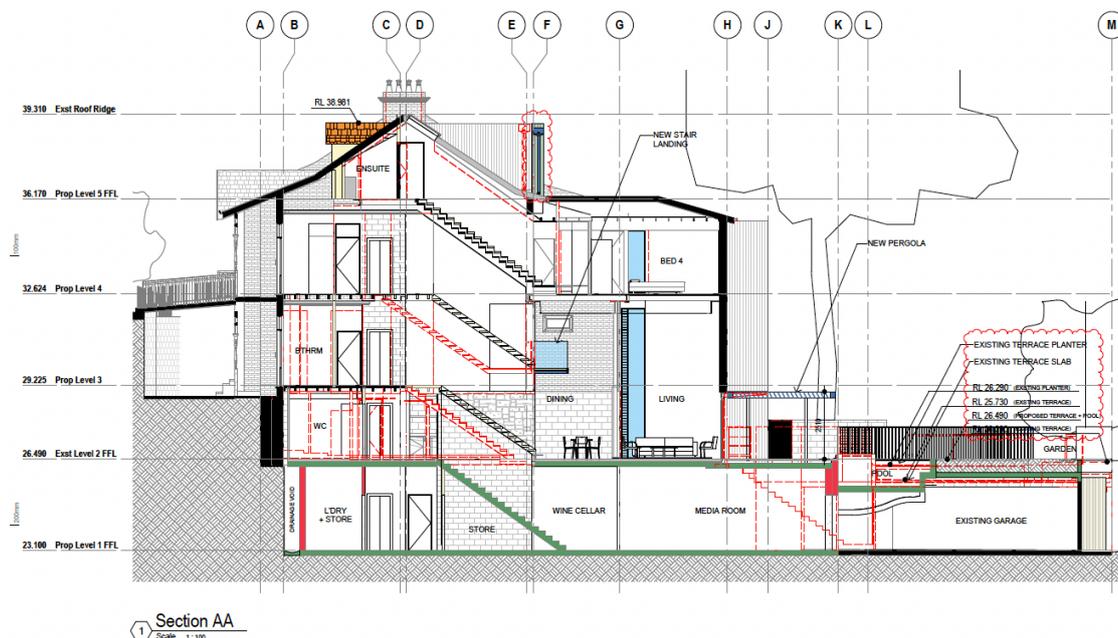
Extract from Drawing DA251 Section A-A, Revision E, shows the two dormer roof elements either side of the existing main roof and ridge and the existing ground level, the floor level of Level 2 shown dashed in red. Clouded in red the amended rear dormer will be reduced in length, largely within the existing roof.
